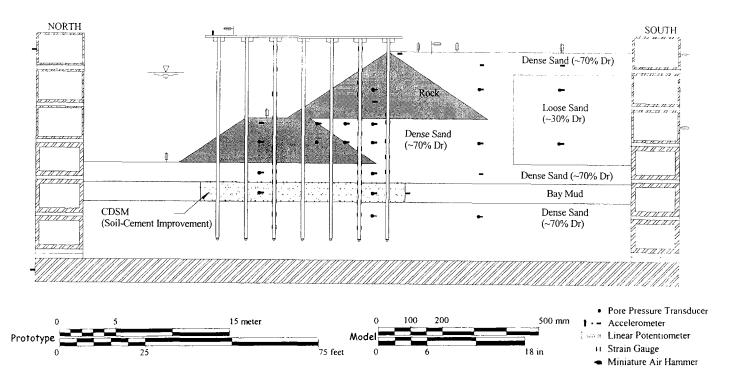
Cross-section view of the container, model geometry, and instrument locations.
